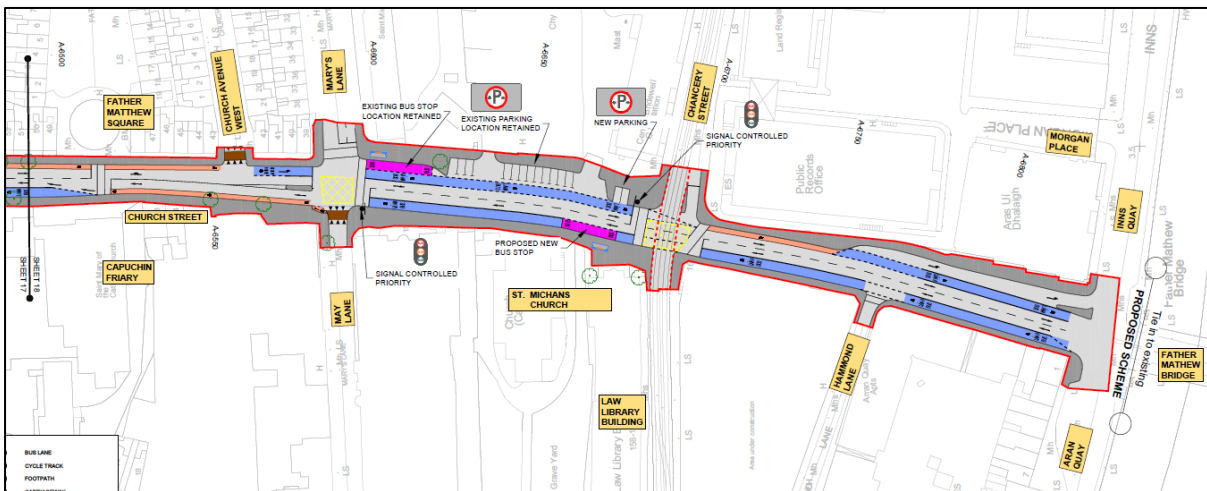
Extract from General Arrangement Drawing Sheet 18
